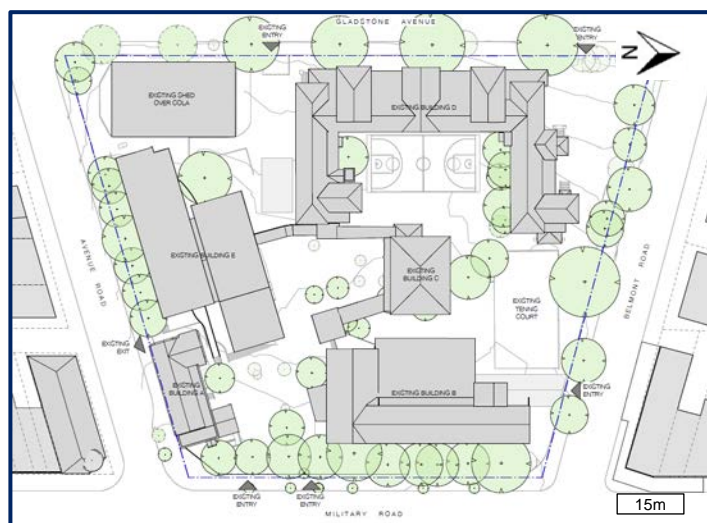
| Existing Site Plan (Source: Applicant's EIS, 2021)
